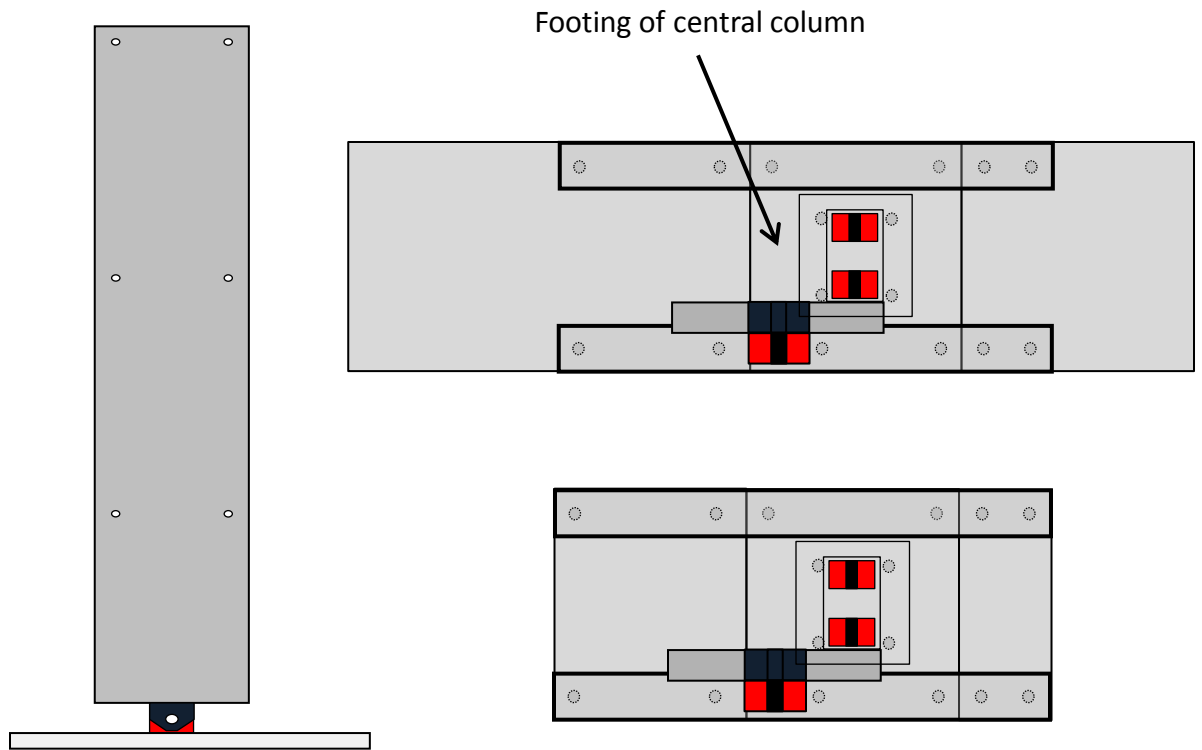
Schematic illustration of reinforcing wall and its foundation.
